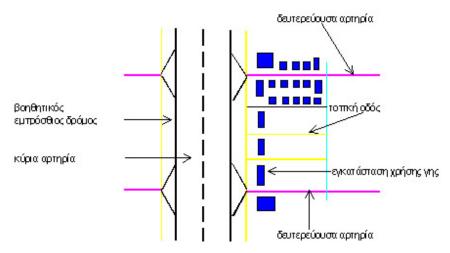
Building next to the road with an auxiliary side road (Source: Maratou, 2001)
